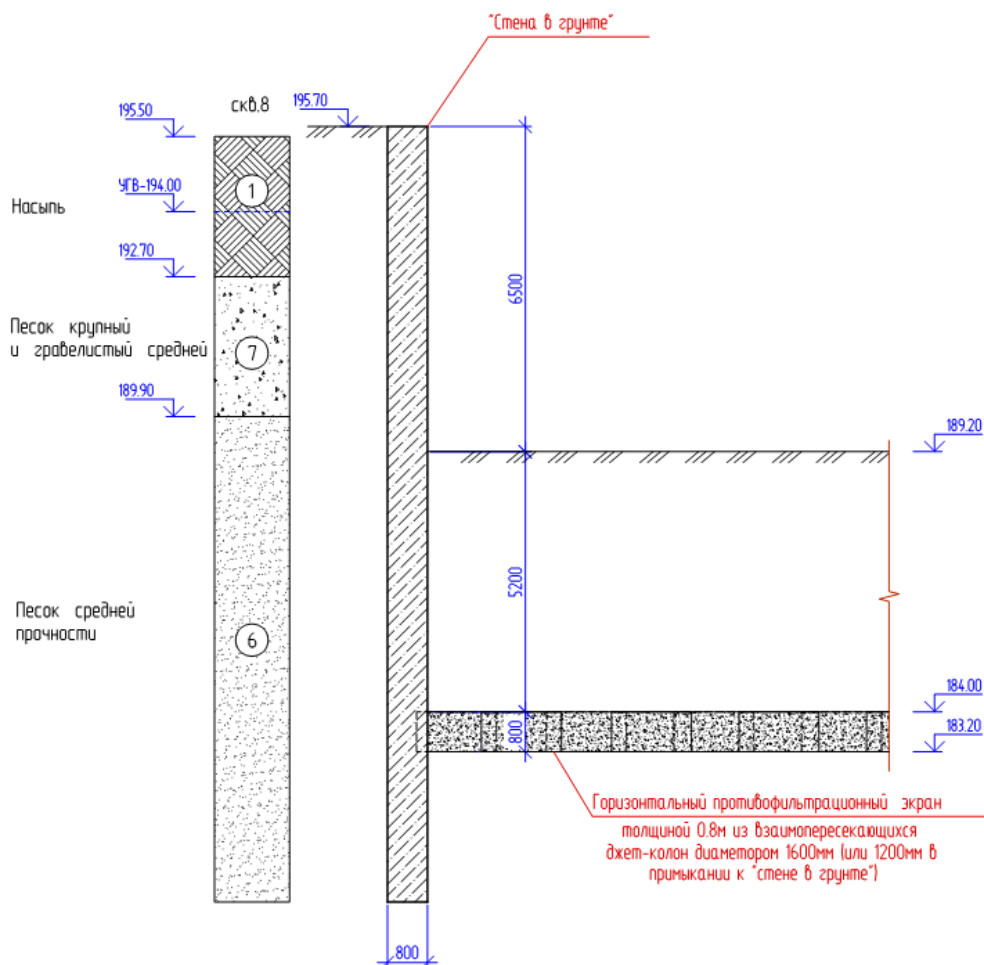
Cross section of the construction of the retaining wall and the anti-filtration screen.
